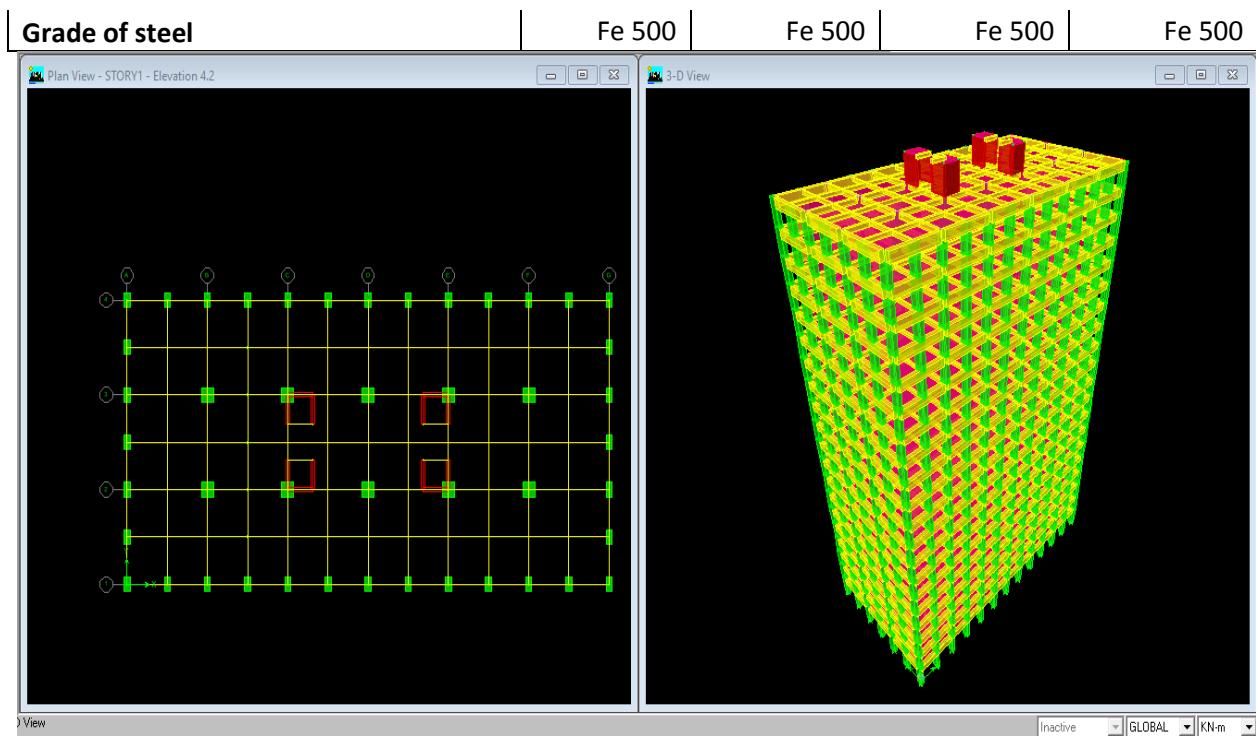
Plan view and 3-D view of 20 storied Framed Tube structure building
